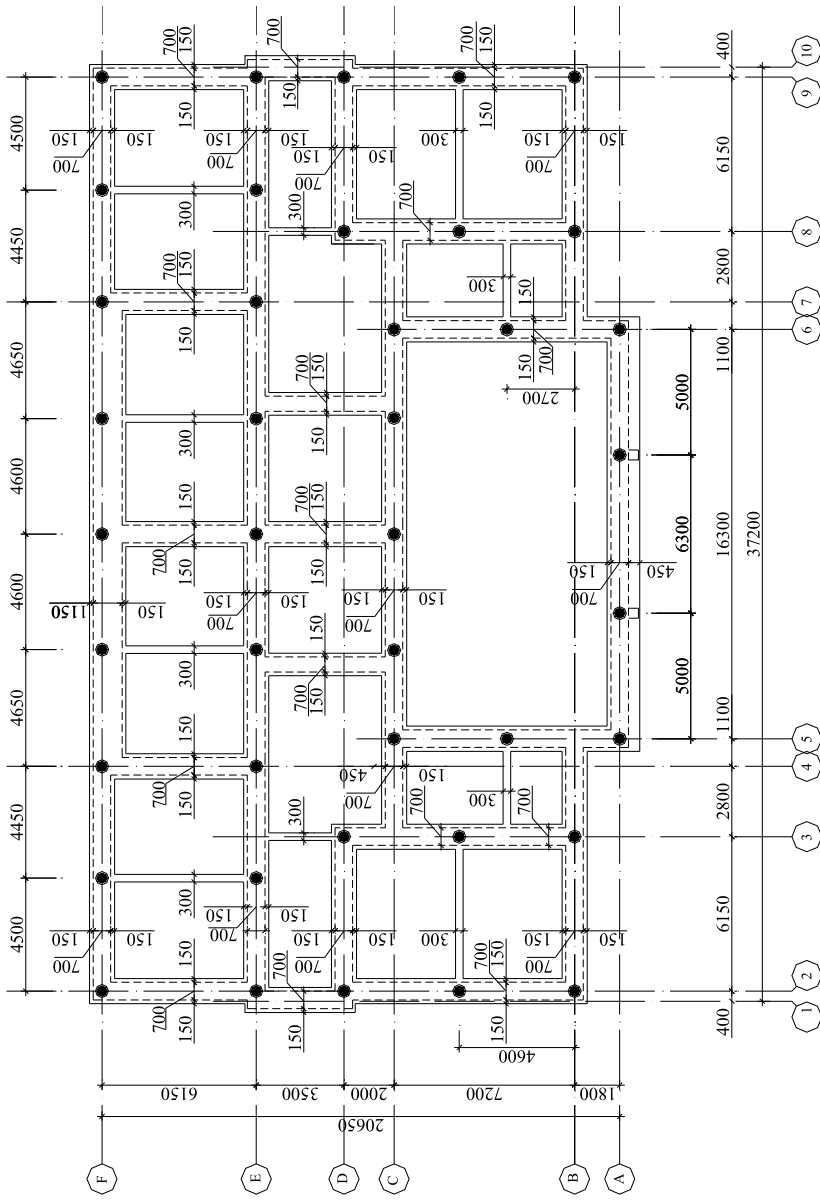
Plan of MDRBs' location on the lower continuous beams in the basement of the school building
